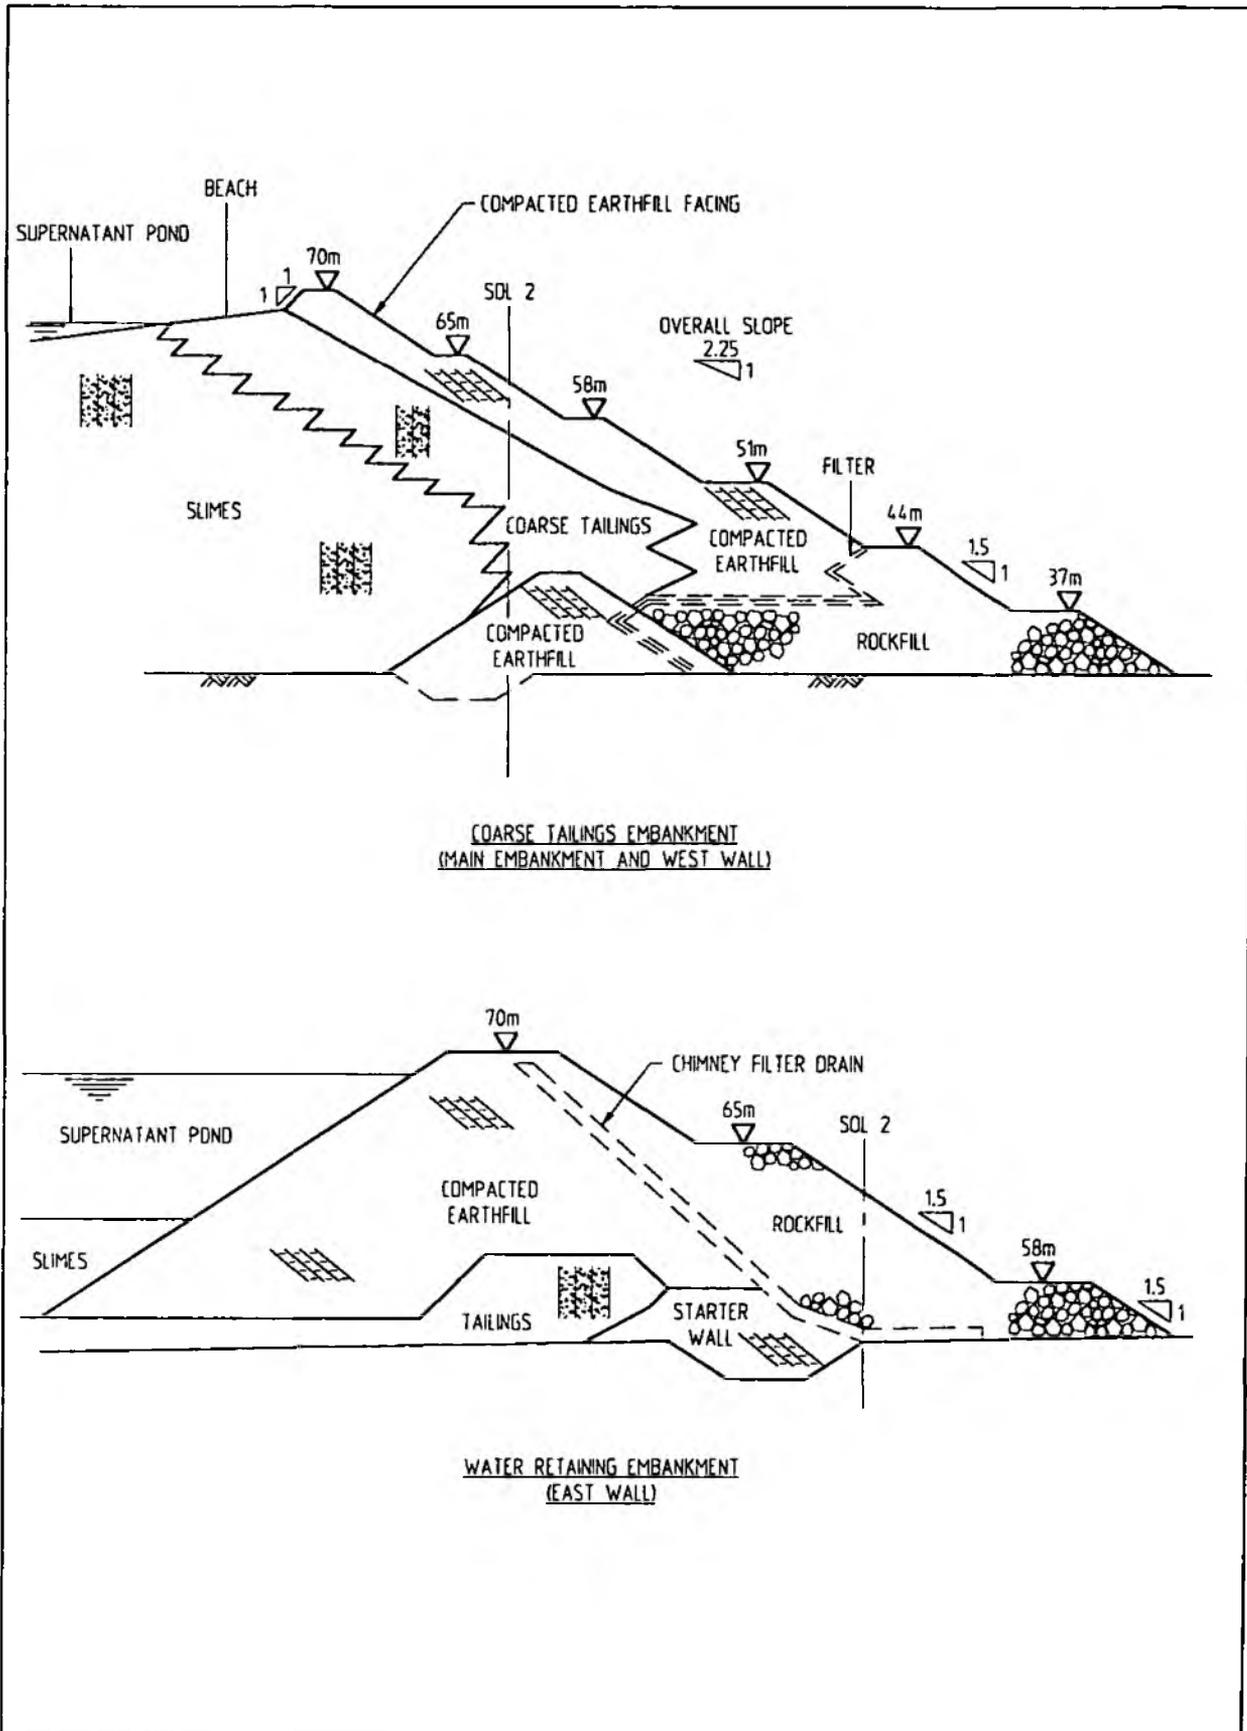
Clemows Valley Tailings Dam – Typical Embankment Sections
